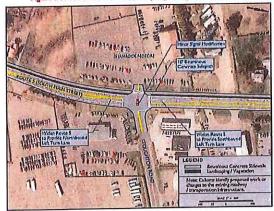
Southern Alternative 1 (S-1) Stoughton Road Inset
